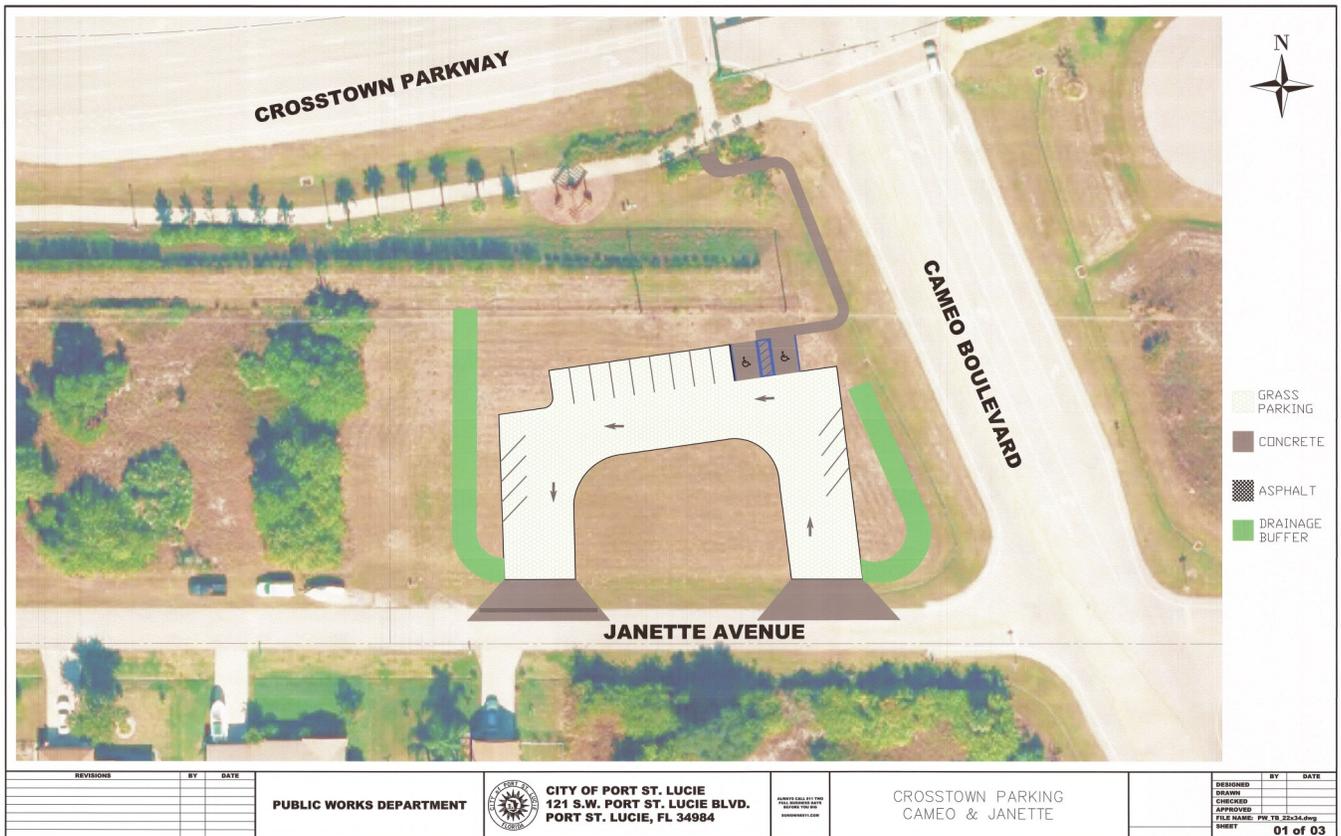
Crosstown Parking Lot (Cameo Boulevard and Janette Avenue)
